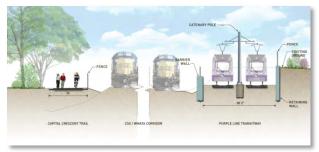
Typical Section in Georgetown Branch Right-ofway
